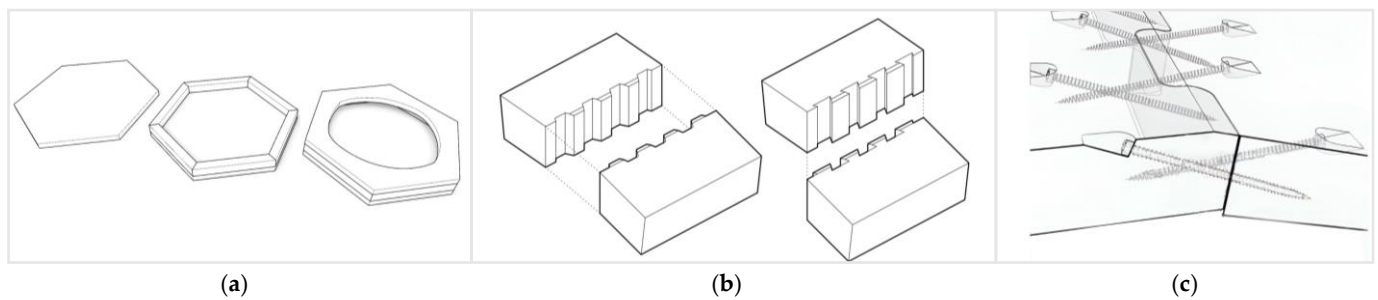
Types of plates and joints. The figure shows (a) Three types of plates: solid plates, an edge-reinforced plate, and a hollow component [19]. (b) Two types of joints: finger joint (left) and a dovetail (right) [19]. (c) Another type of joint: crossing screw connection [21].
